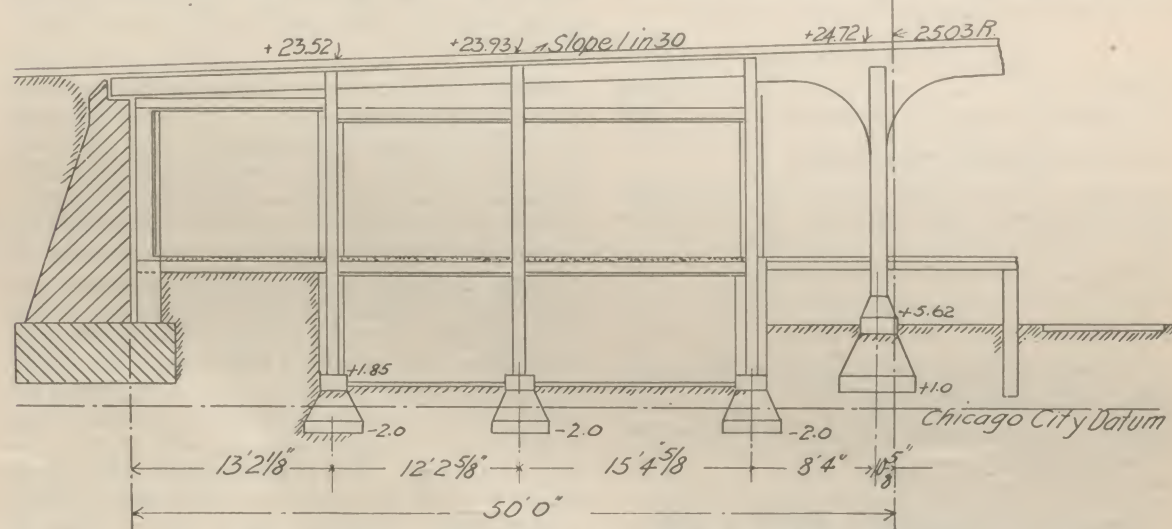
SECTION THROUGH VAN BUREN STREET STATION.
